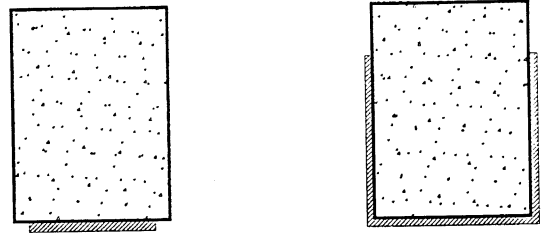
Flexural and shear strengthening of reinforced concrete beams
